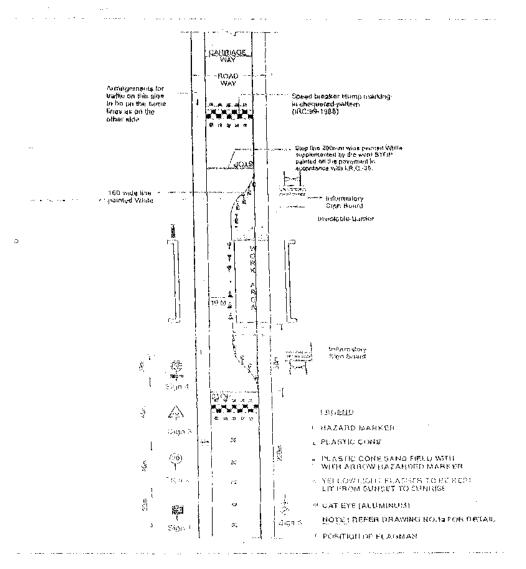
Arrangement During Reconstruction of Cross Drainage Structures where Traffics can be Passed Over Part Width
